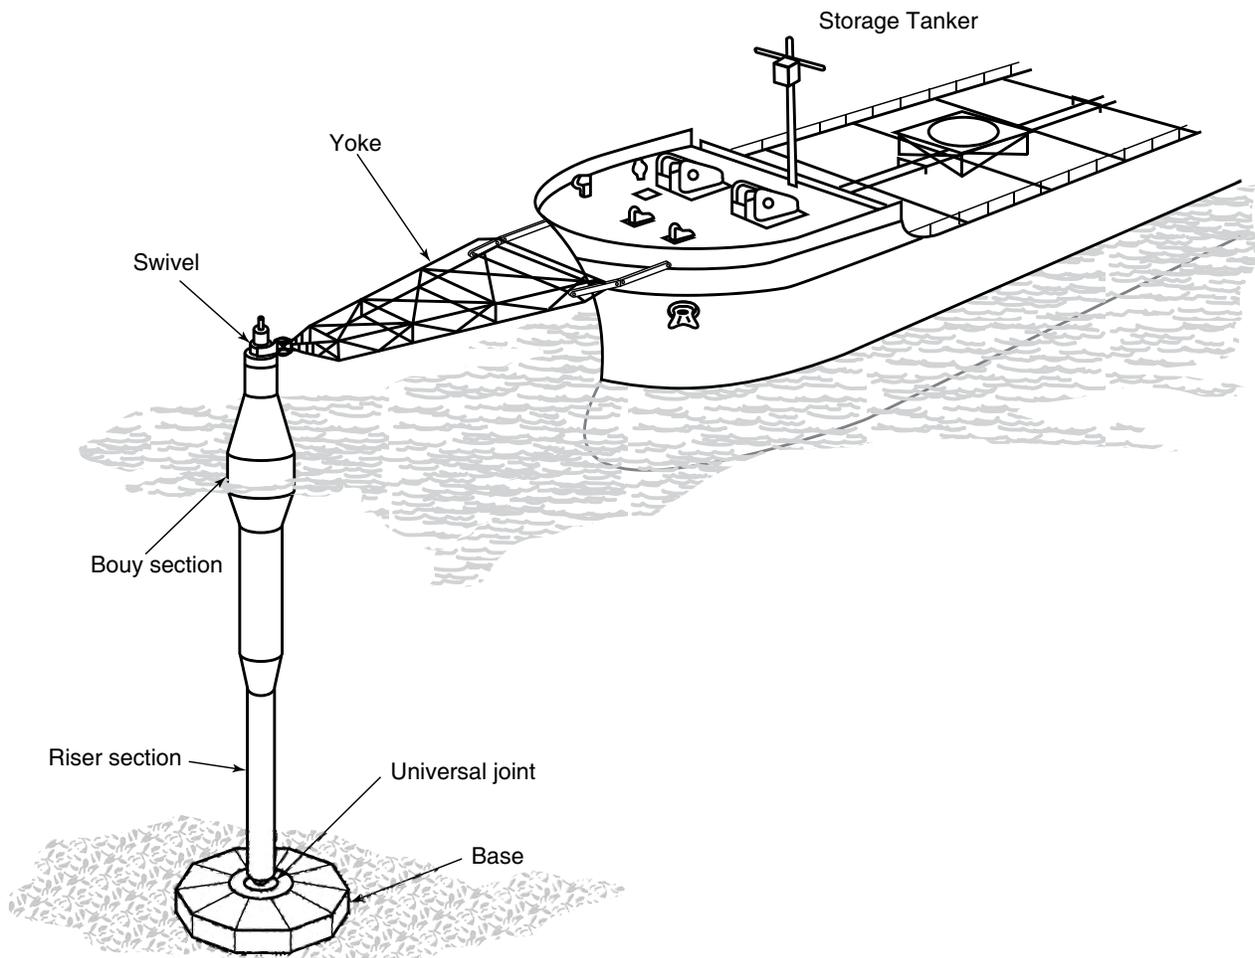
Single Anchor Leg Mooring (SALM) with Tubular Riser and Yoke
